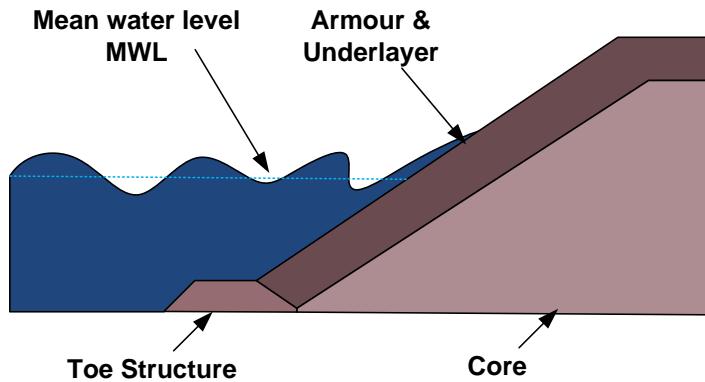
SCHEMATIC OF BREAKWATER CROSS SECTION
